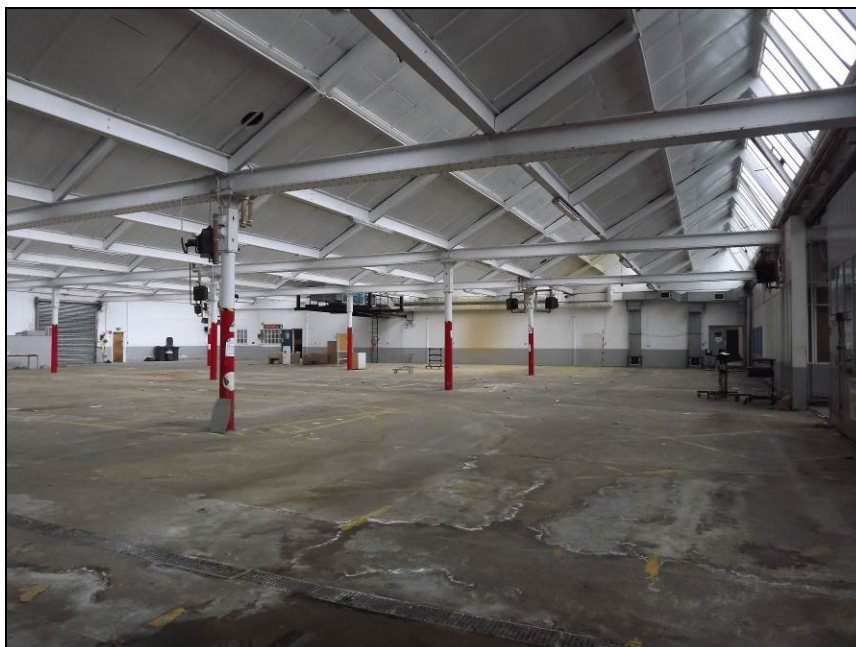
View looking north-west showing the possible inserted brick wall between the main former factory floor and the offices
